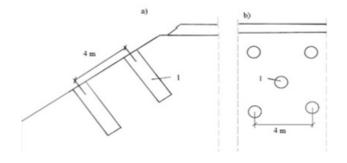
Stabilization diagram of recess sloping parts by introducing reinforcing additives: 1 - soil reinforced masses;
